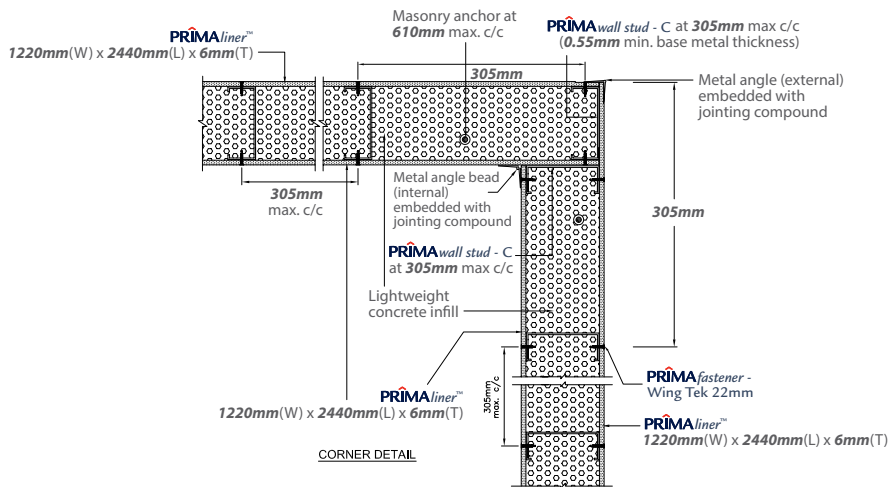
Corner wall intersection of solid infill wall to solid infill wall
